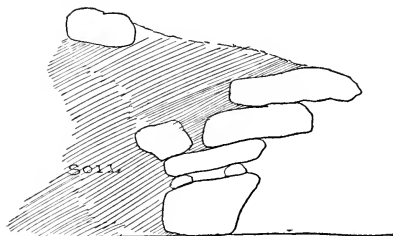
An overhanging rock is an interesting feature in a rock garden. This cross section shows how it should be built up
